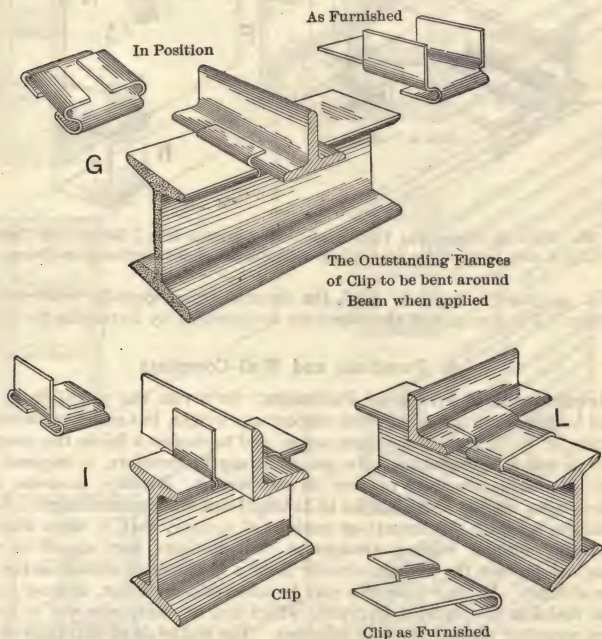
Clips for Fastening Tees and Angles on I Beams and Channels
